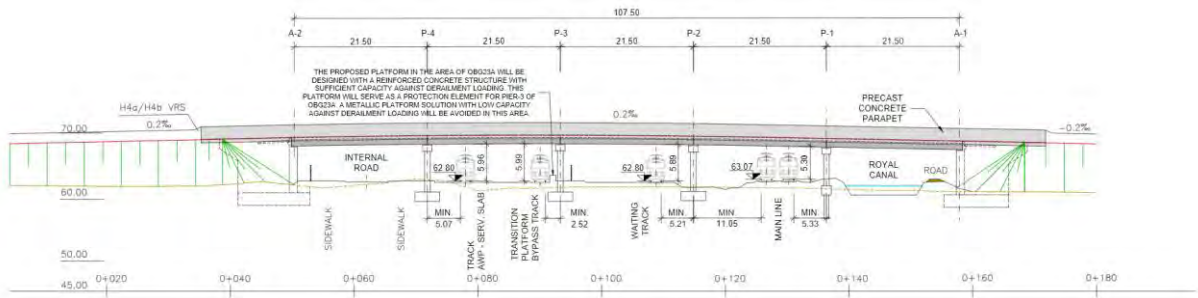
Proposed span arrangement for OBG23A - elevation
